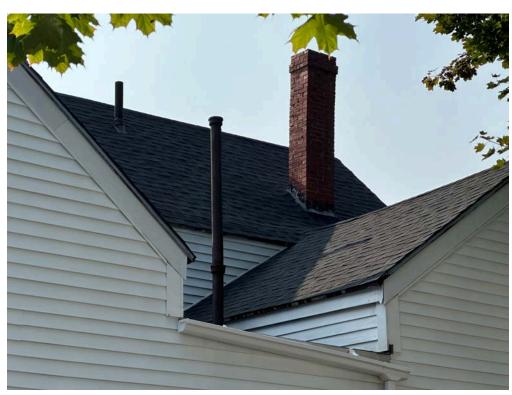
CHIMNEY AND VENTS REAR ELEVATION, RIGHT SIDE
